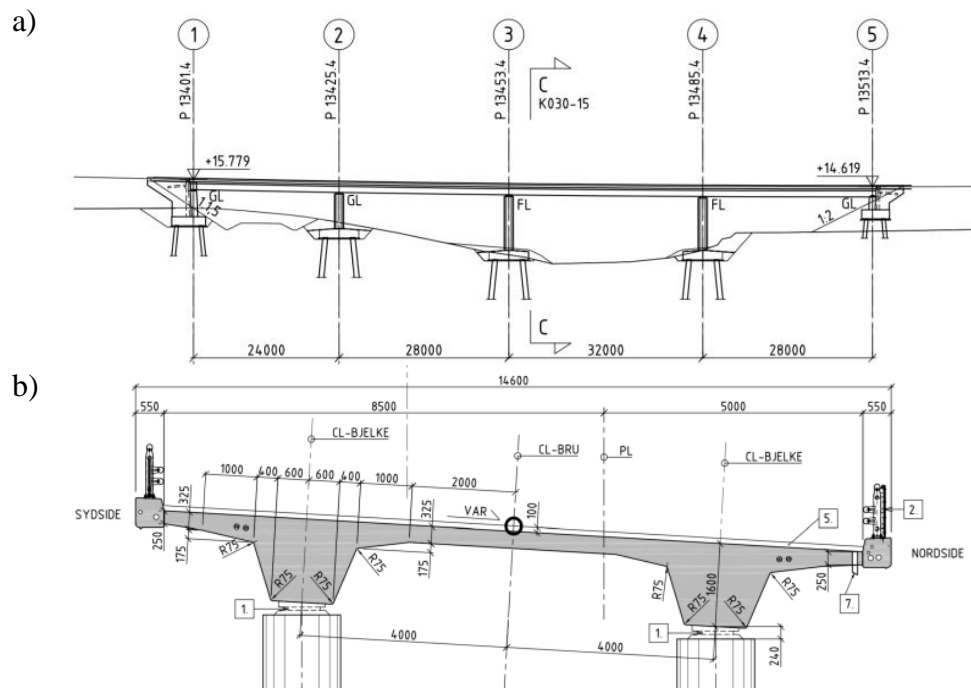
Rossvollbru; a) Overview of bridge; b) Cross-section
